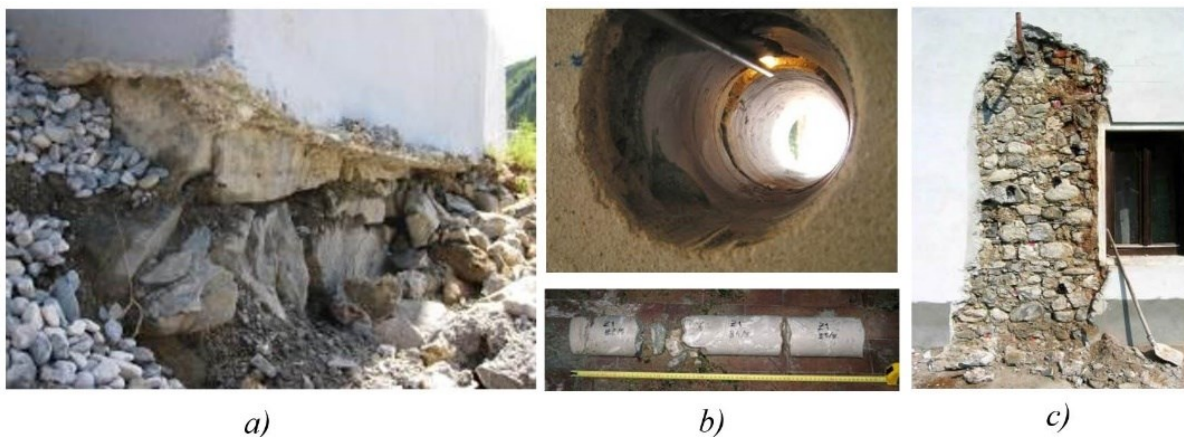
Invasive inspection of foundations and walls. a) Foundation of a small church; b) Drilling in a stone masonry wall; c) Removing plaster to inspect wall typology (Photo: Archive ZAG)
